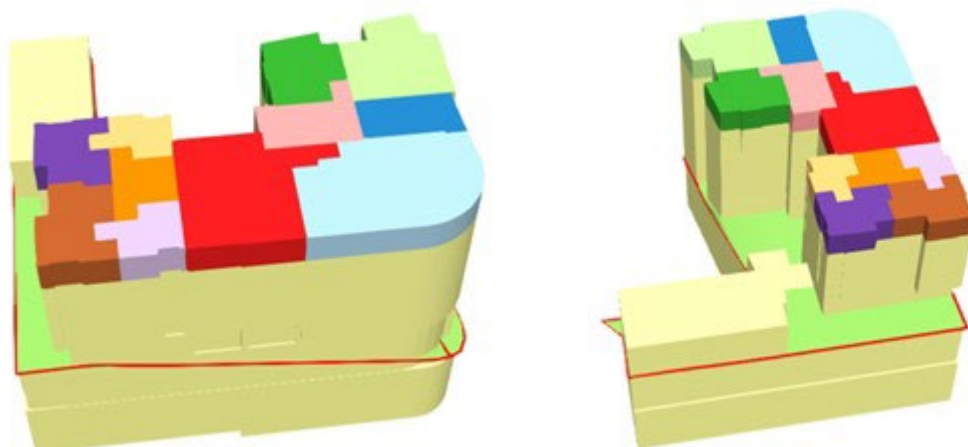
3D cadastral objects (house with underground structure and building with building units )
